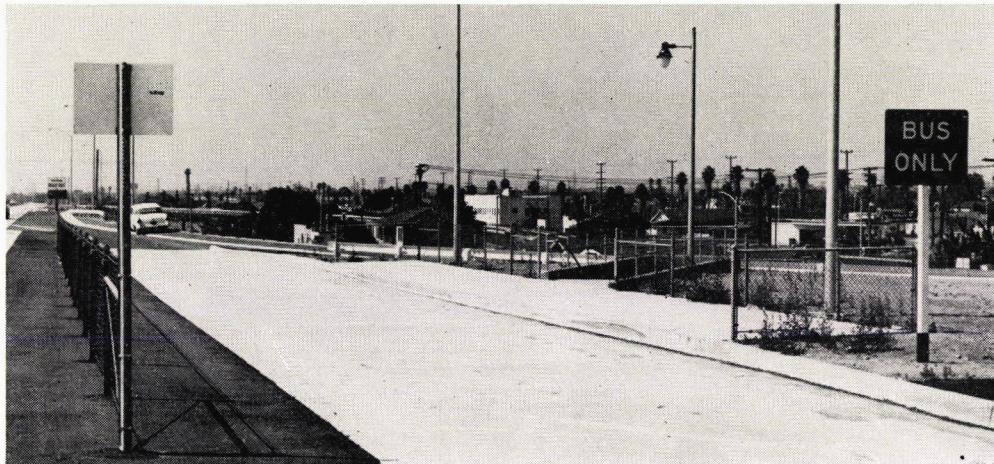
Typical bus loading facility constructed in Los Angeles area (Harbor Freeway, at Manchester Ave.)
